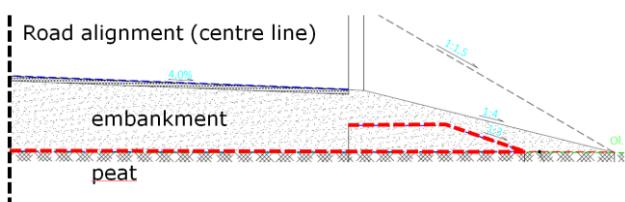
Cross-section of test section 1. 1-layer georeinforcement.
